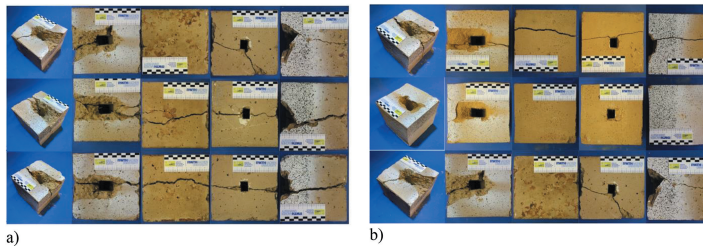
(a) bc test specimen after bond failure; (b) ibac test specimen after bond failure.
